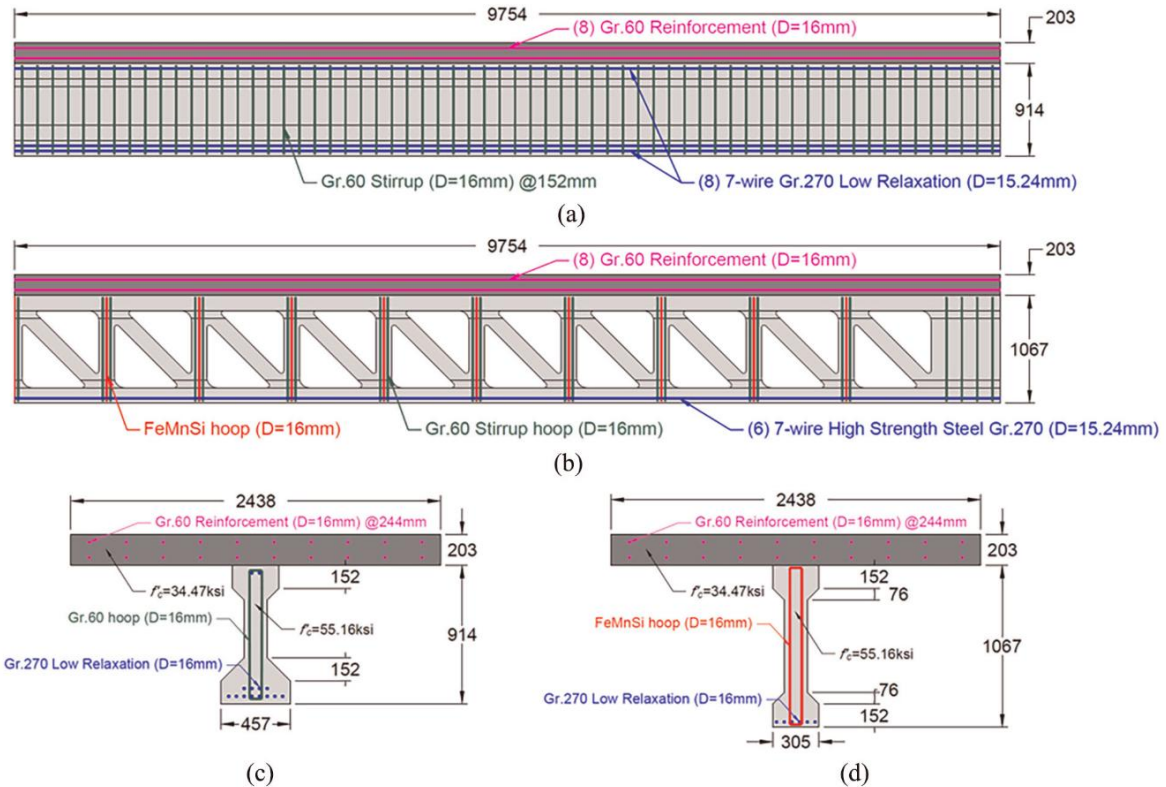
Elevation of (a) AASHTO type II bridge and (b) concrete truss bridge; Cross-section of (c) AASHTO type II and (d) concrete truss.
